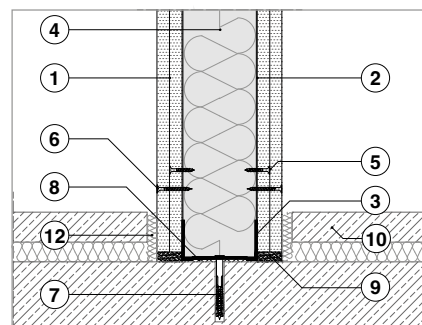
Connecting a partition wall with concrete floor and dry screed panels with dry jointless floor against the wall
